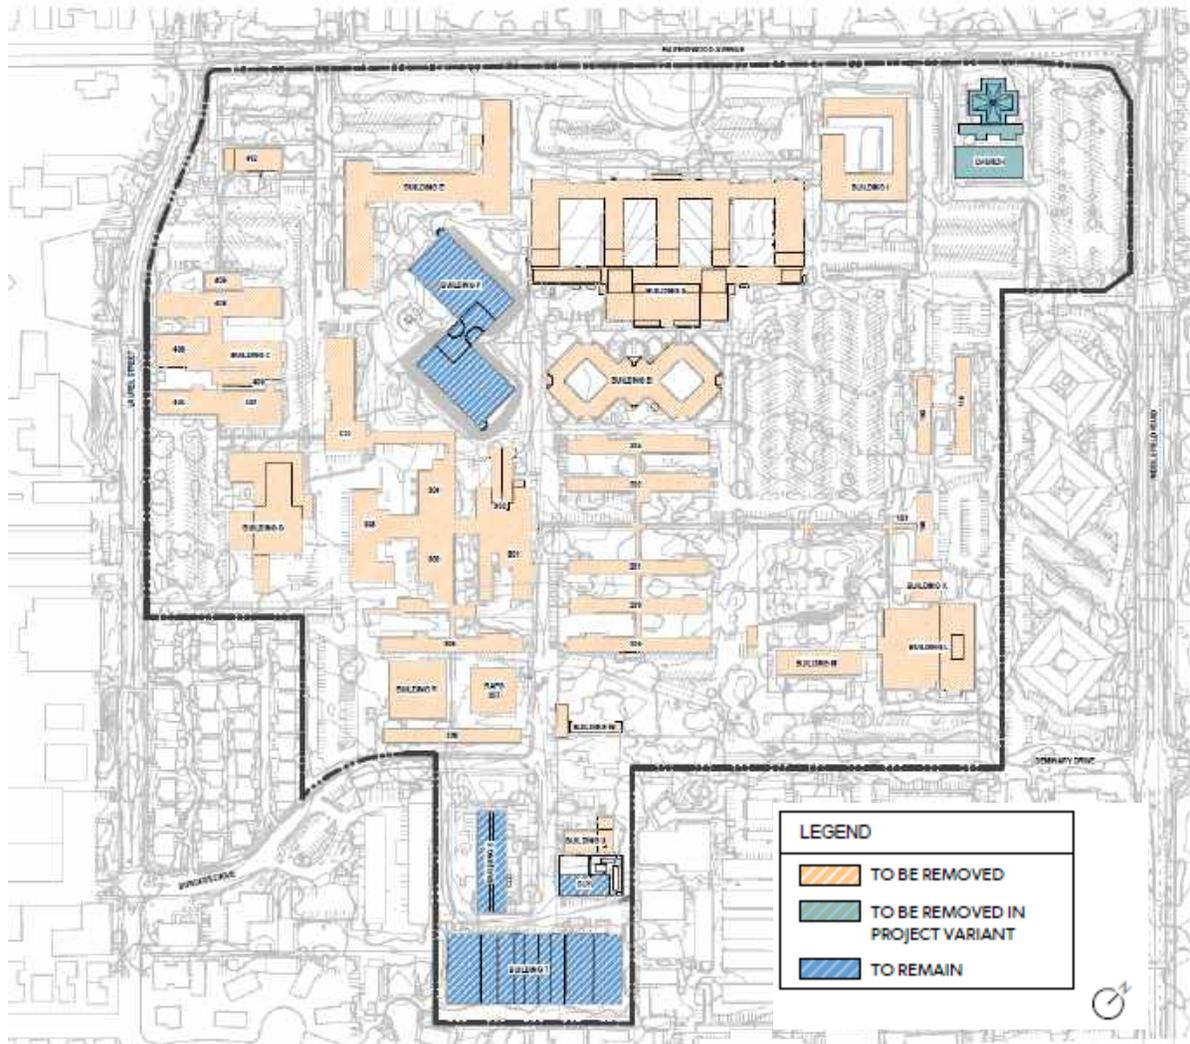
Map of Project Site showing buildings to be demolished in the Proposed Project (orange) and buildings to be retained (blue) in Proposed Project and Project Variant. Buildings at 201 Ravenswood Avenue (teal) would only be removed in the Project Variant. Source: STUDIOS, "Existing Building Footprint and Demolition Plan" Sheet G1.06, dated October 31, 2022 (updated March 5, 2024).
